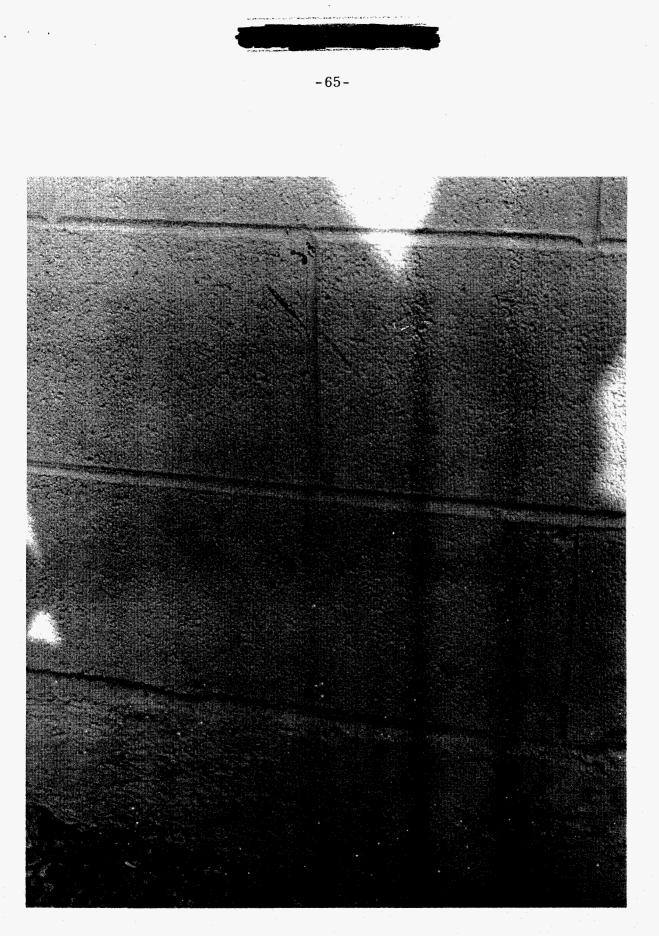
Building 710, south side, 0.13 cm/sec.
